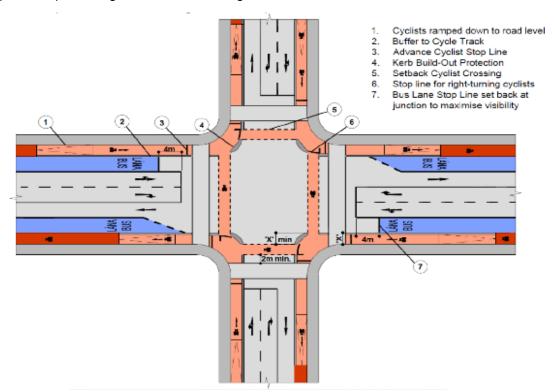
Typical Junction Layout from BusConnects Design Guidance Booklet
